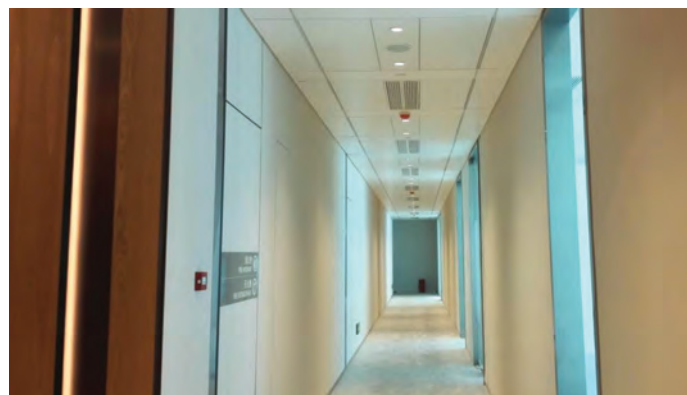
Guangzhou CTF Centre – corridor at a typical office floor (Source: WSP|PB)
